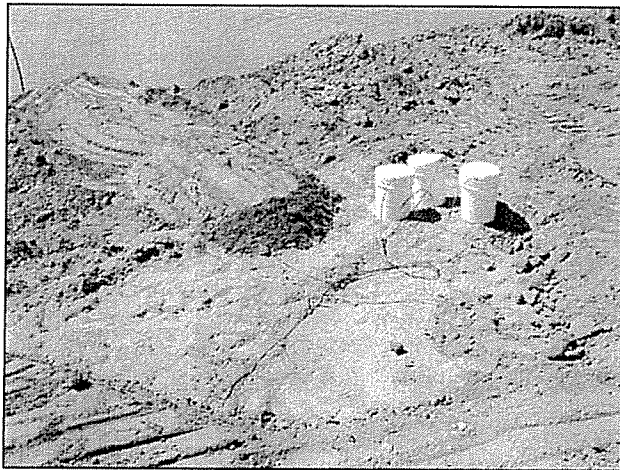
& 12: Piezometer installation on the Perimeter Embankment
